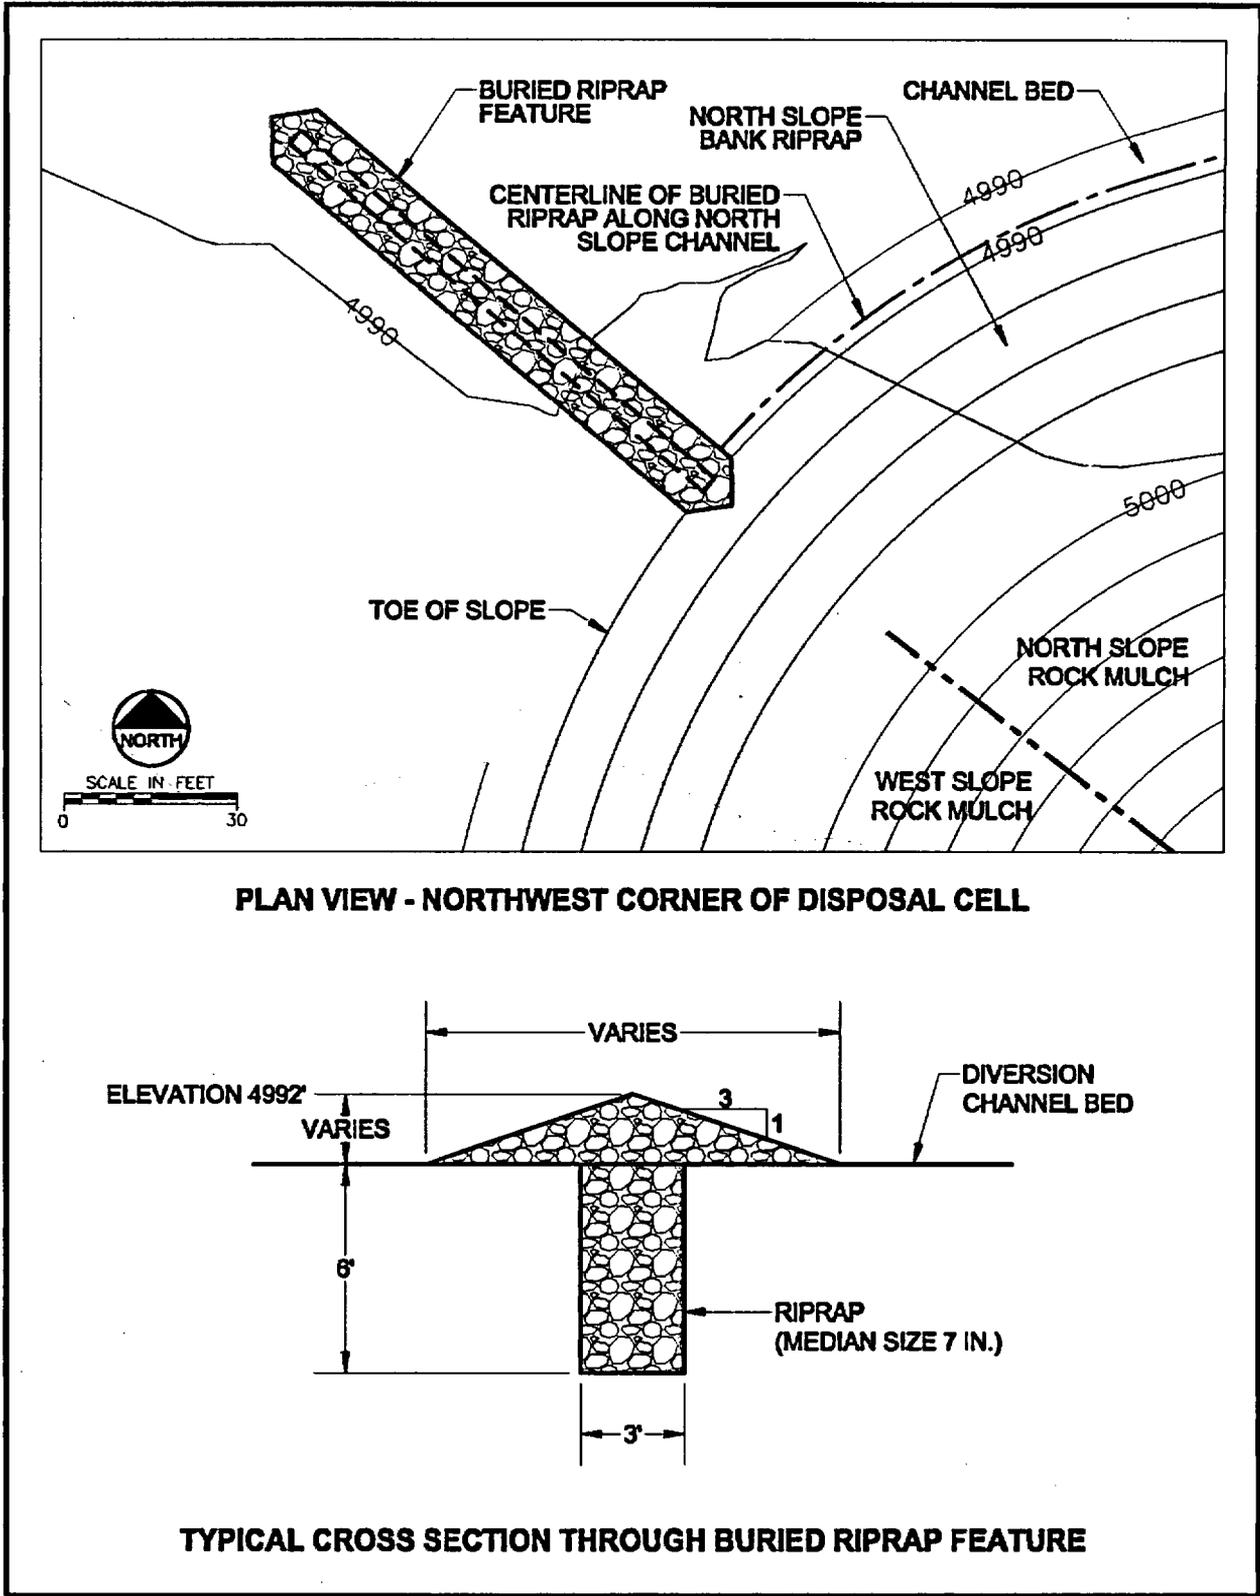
Buried Riprap Feature Plan and Cross Section
